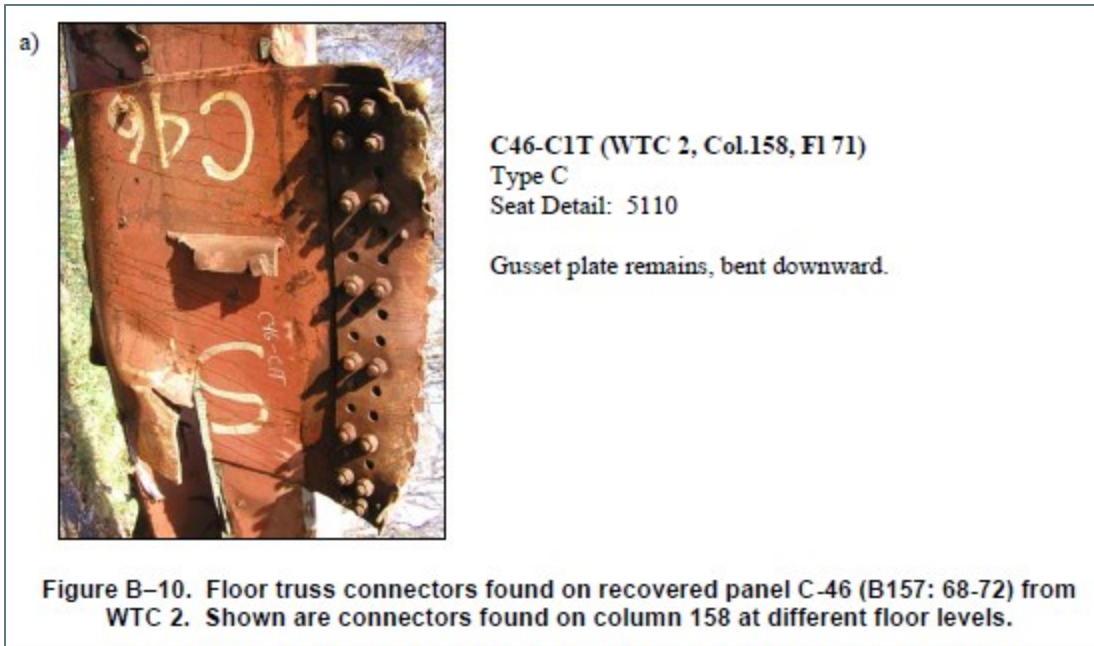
A perimeter column floor truss connection from floor 71 of the South Tower ("Zone 2") indicates downward acting forces that bend the gusset plate downward based on the geometry of the destruction.
